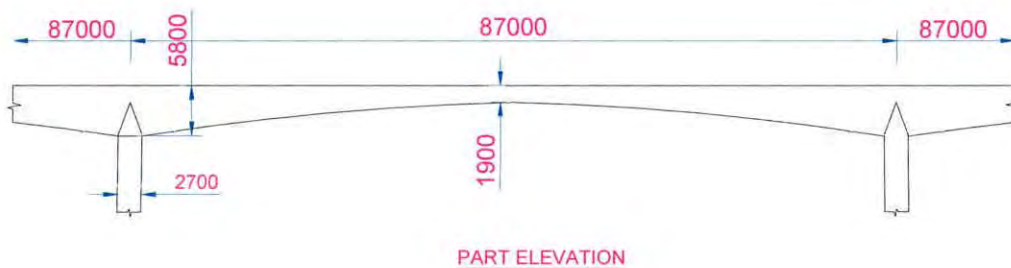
Typical Sectional View of Prestressed Box Girder of Meghna Bridge
